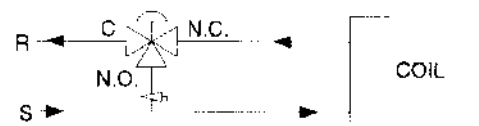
Mixing Valve in a Bypass Application Piped NC. to Coil
